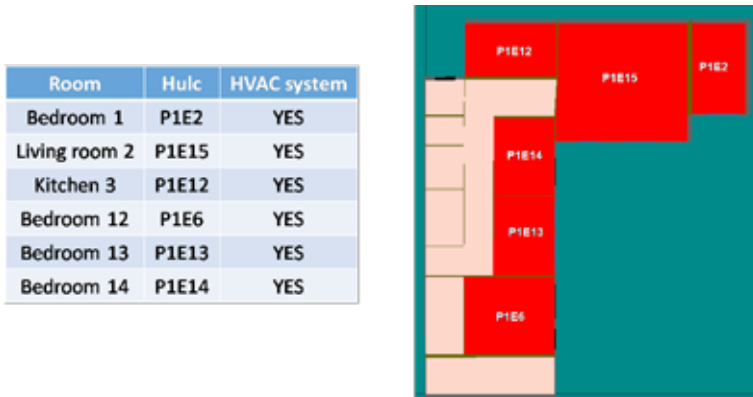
Rooms of the house equipped with HVAC systems (Source: M.R.de Adana's private archive)
